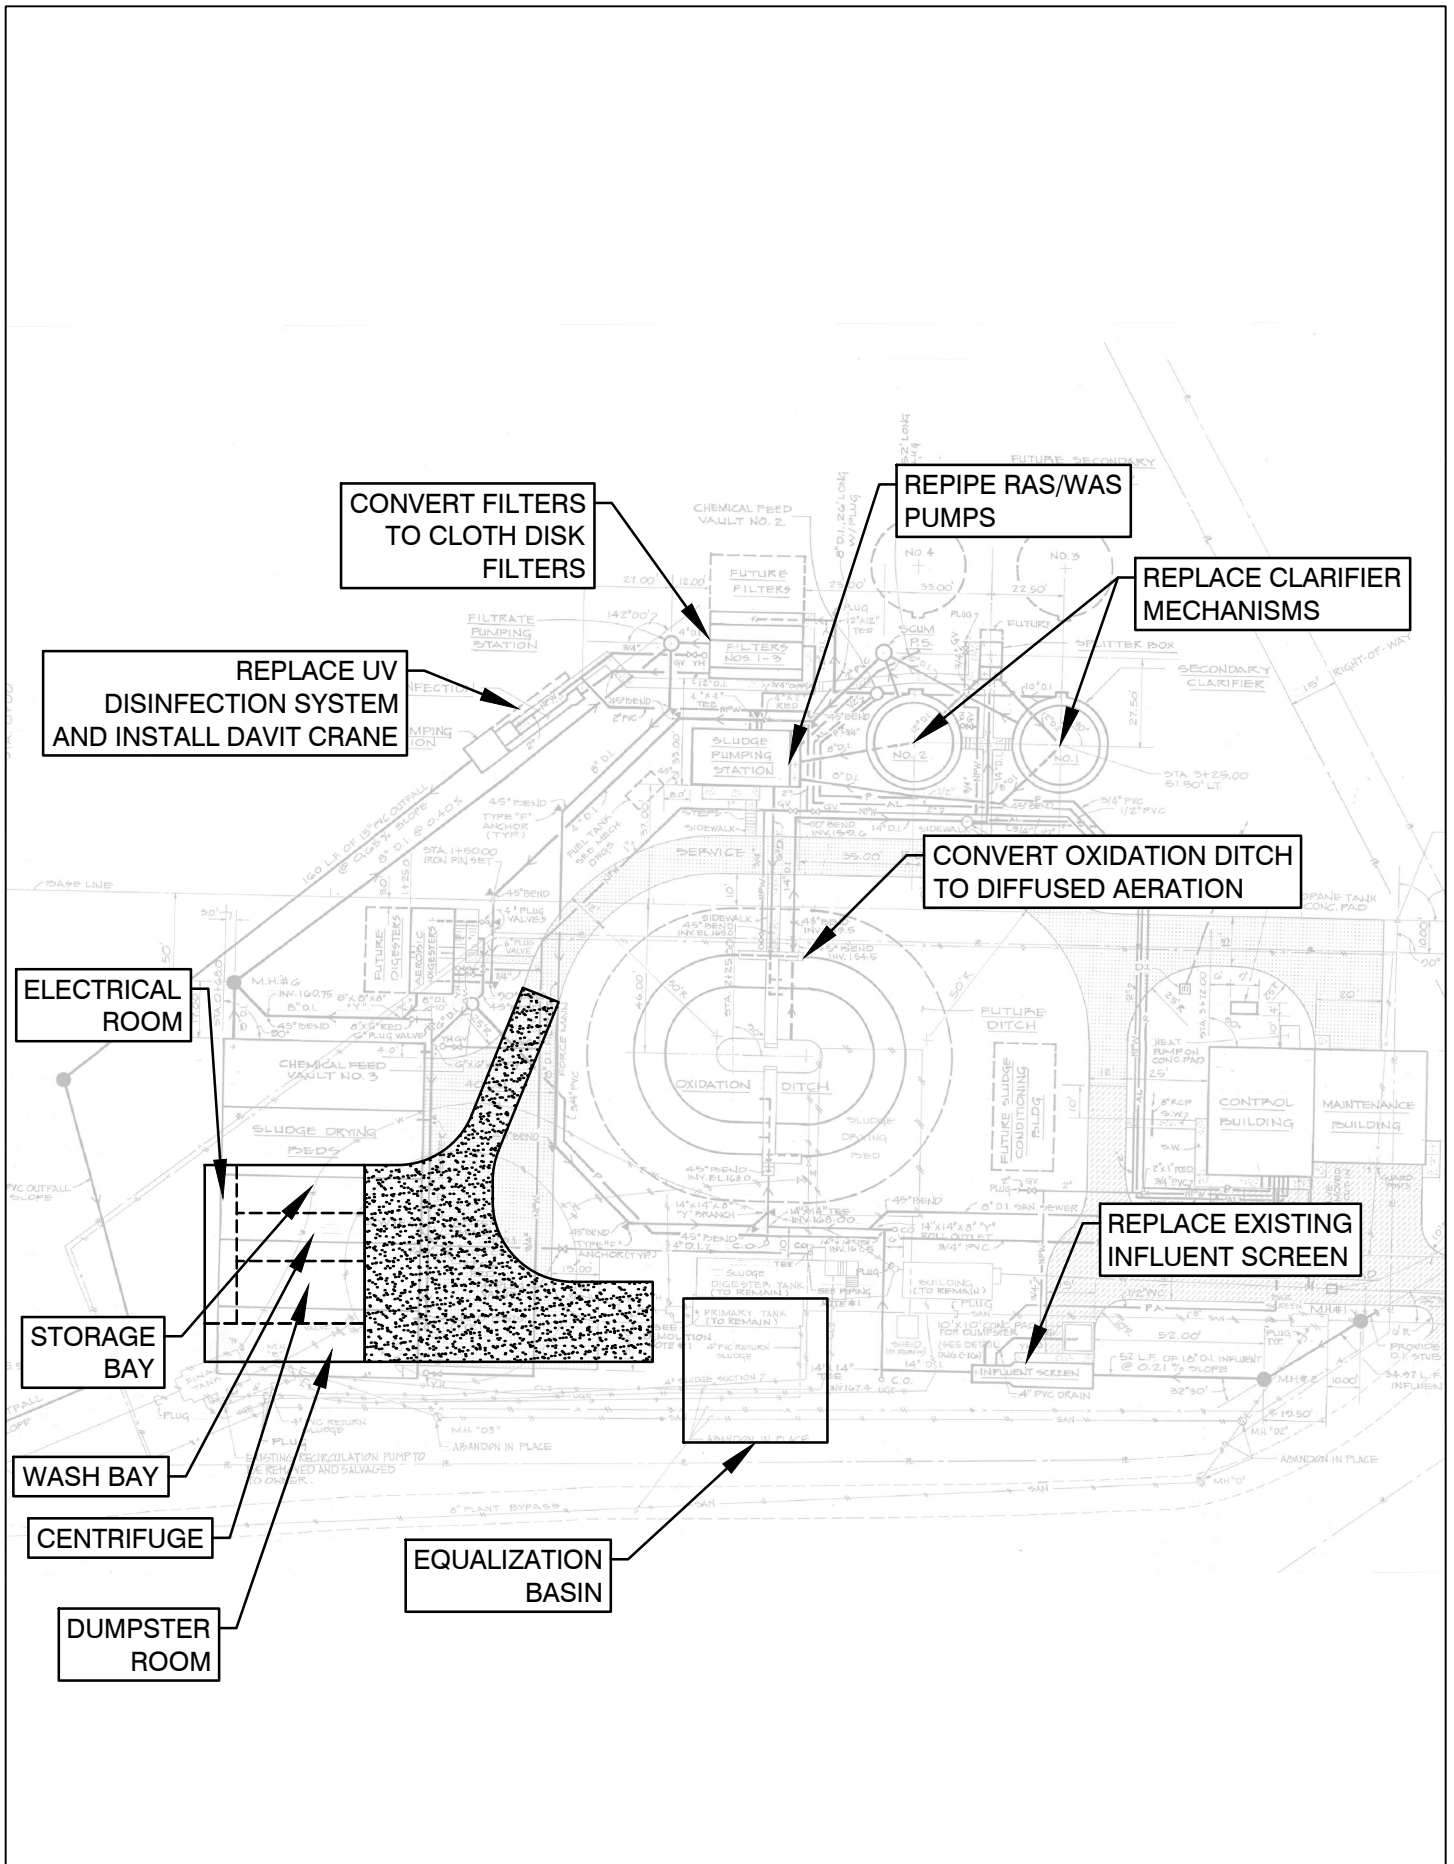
CONVERT EXISTING OXIDATION DITCH SITE LAYOUT
